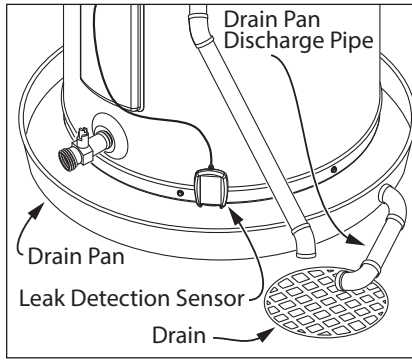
A suitable drain pan piped to an adequate drain can help protect flooring from leaks and drips.
